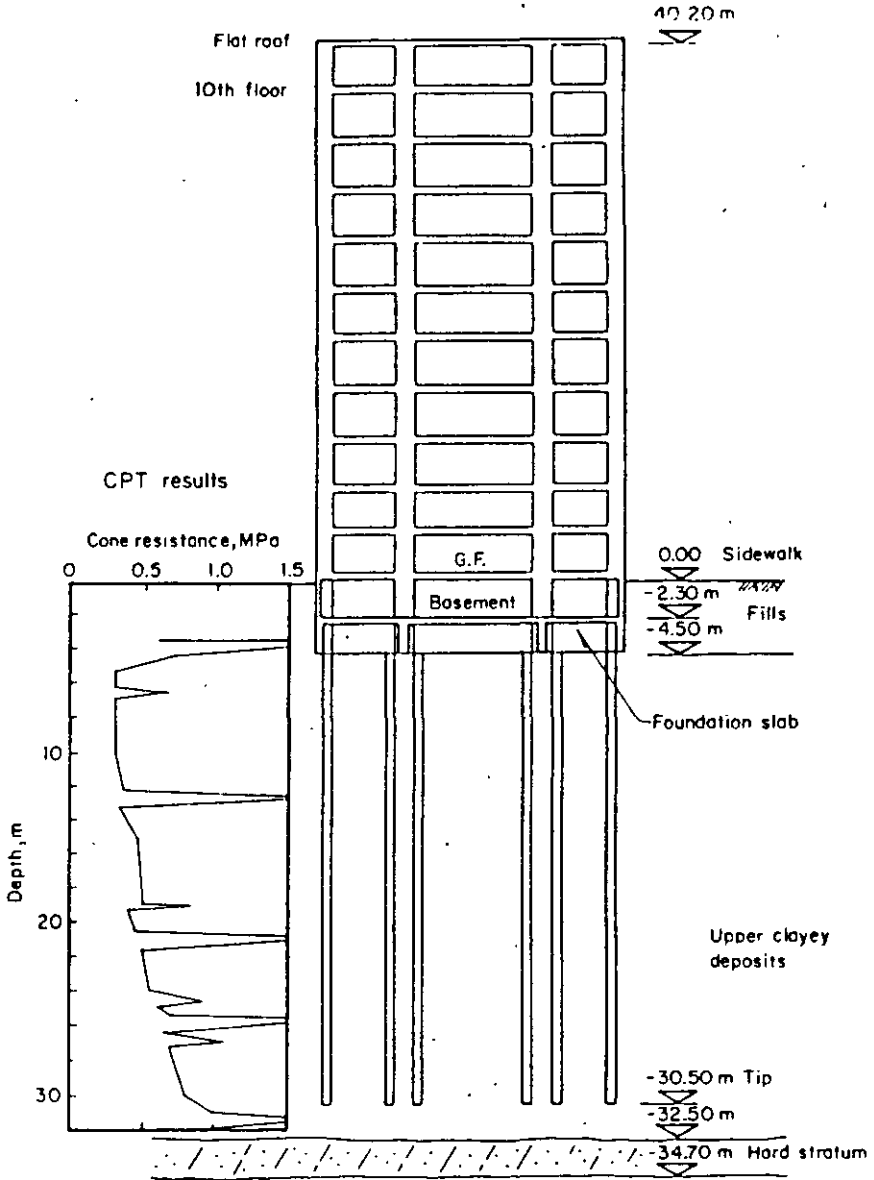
Elevation of the Building IV including foundation and geotechnical conditions.
